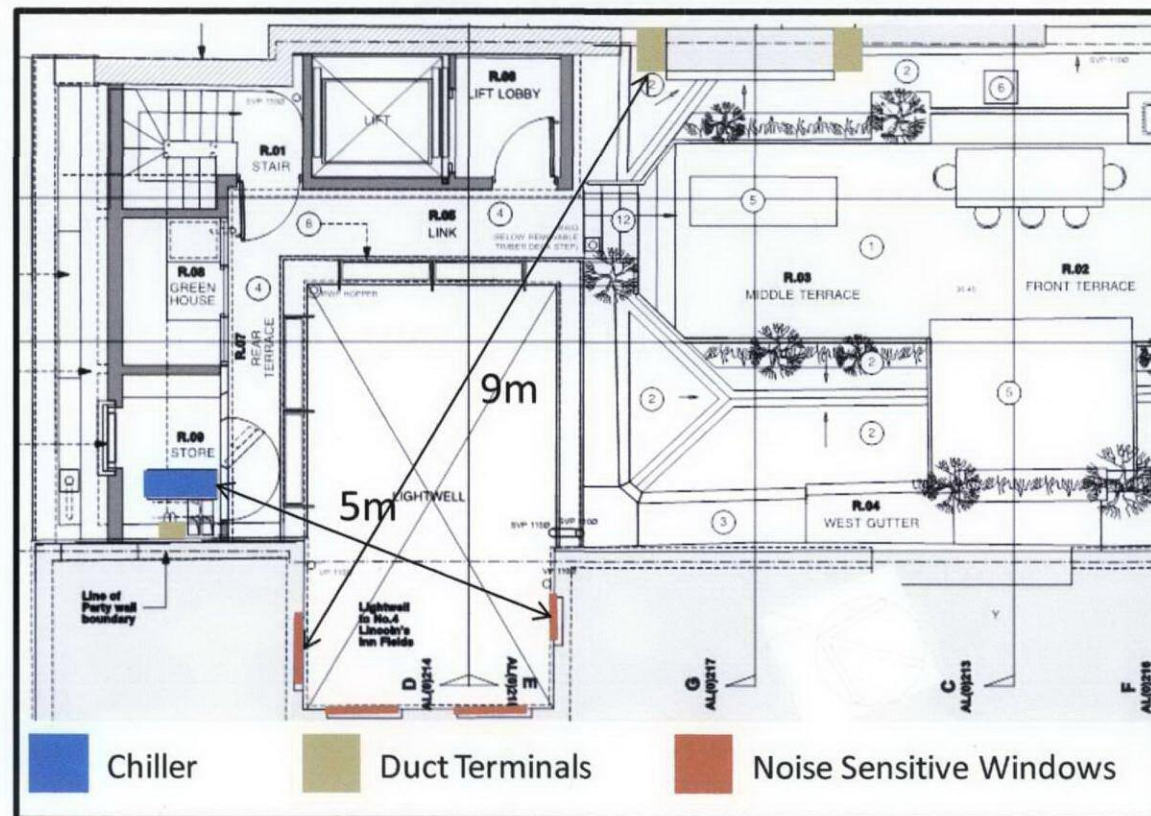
Rooftop Plant Location and Nearest Neighbouring Windows
